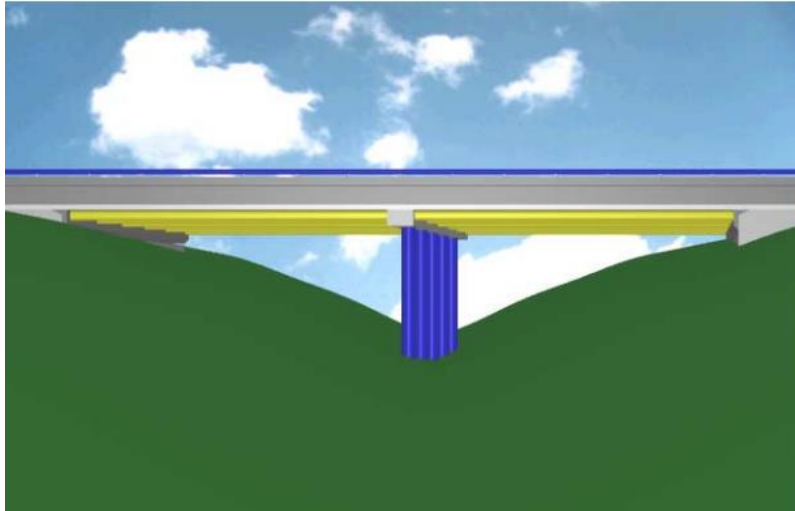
Conceptual rendering of the side view of Kings Stormwater Channel Bridge (Zhao, 2000)
